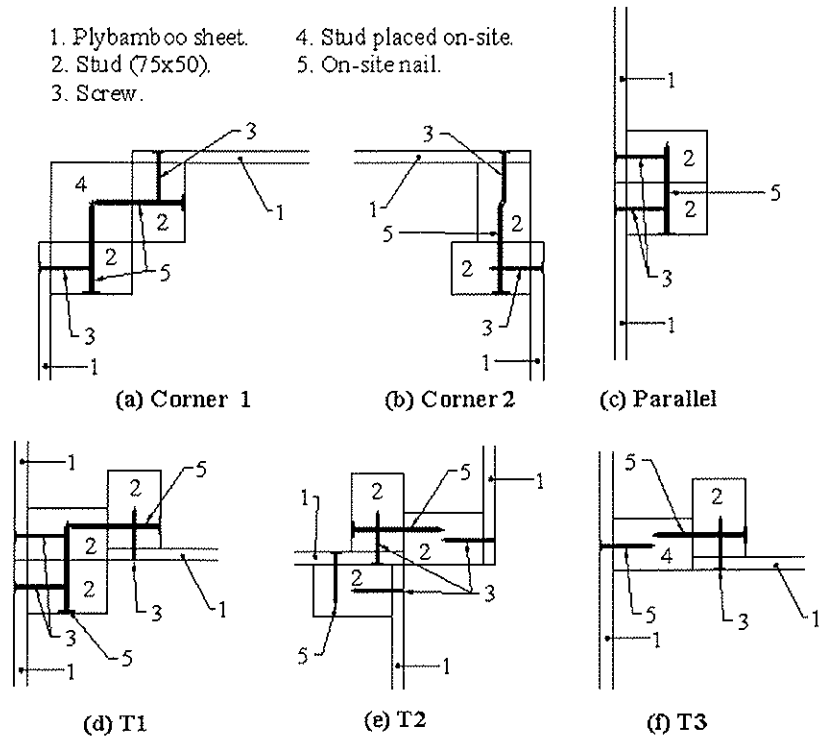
Details of the wall-to-wall connections according to Figure 3.
